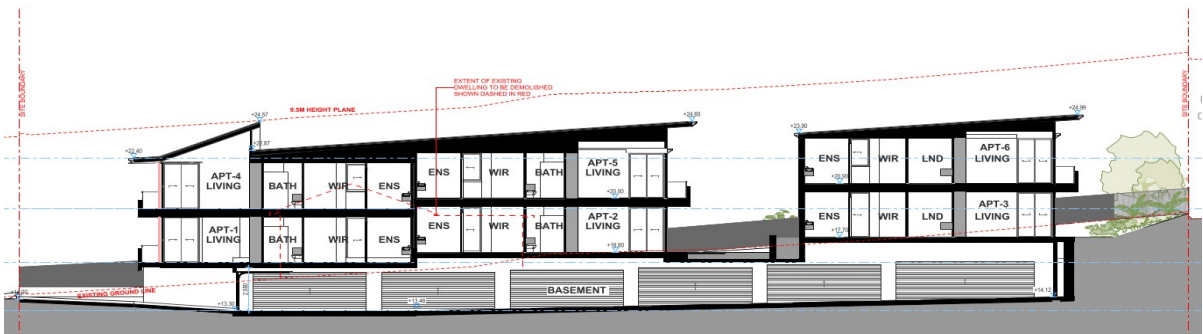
Extract of DWG 0628-DA112 01 (longitudinal section) showing 9.5m building height plane and building relationship
